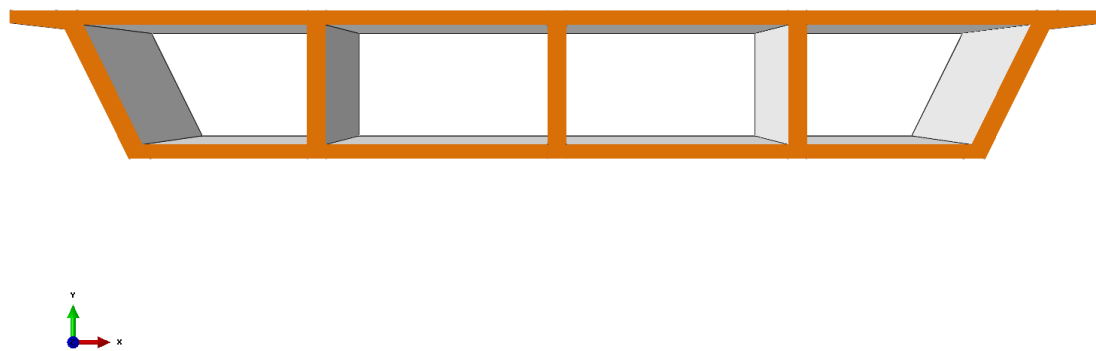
Perspective view of a typical box-girder cross-section modeled in ABAQUS
